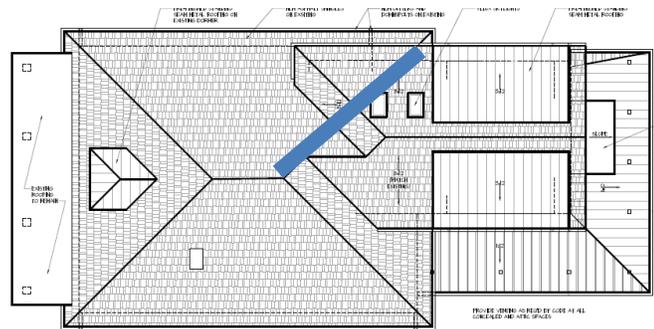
The wide line added to the roof plan shows the ridge that will be lost with the proposed addition.
